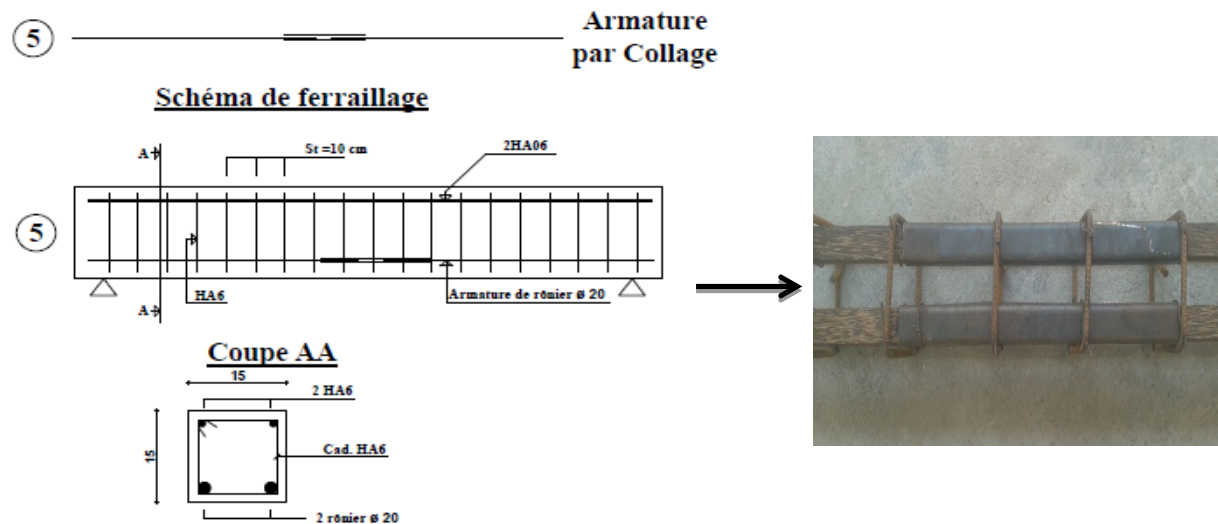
Beam reinforced with palm assembled by sticking with iron galvanized tubes in U shape
